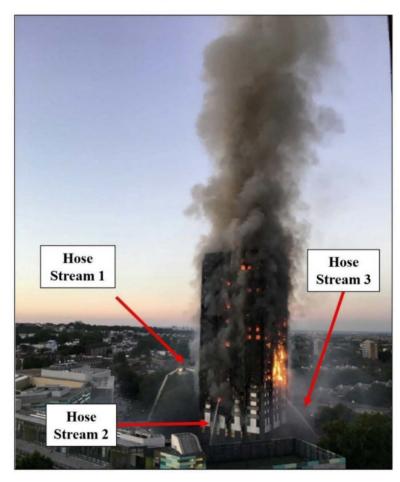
Firefighting jets on building envelope - East, North, and West elevations - at 04:43 on 14^{th} June 2017 (MET00012593)
